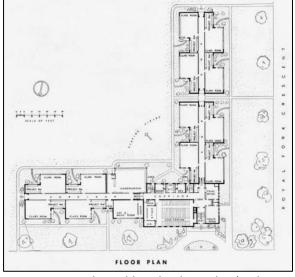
Sunnylea Public School site plan (Parkin 1943)
